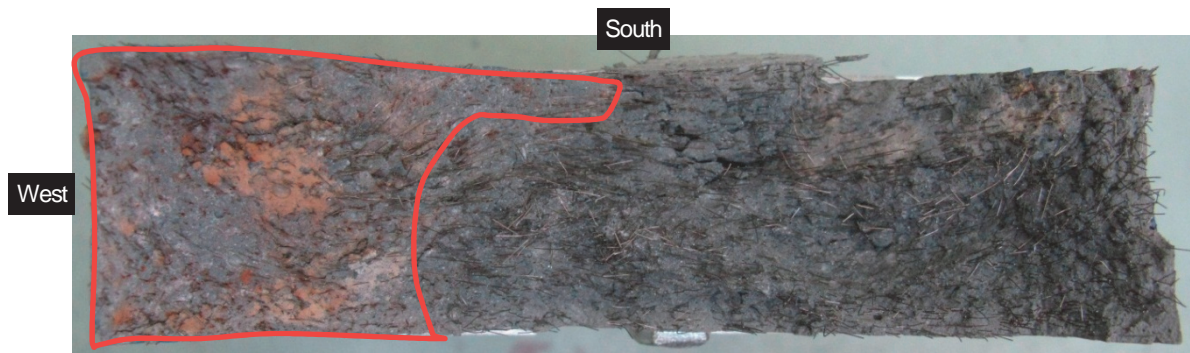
Fatigue fracture surface of S4-3 test specimen (upper half of the fractured specimen)
